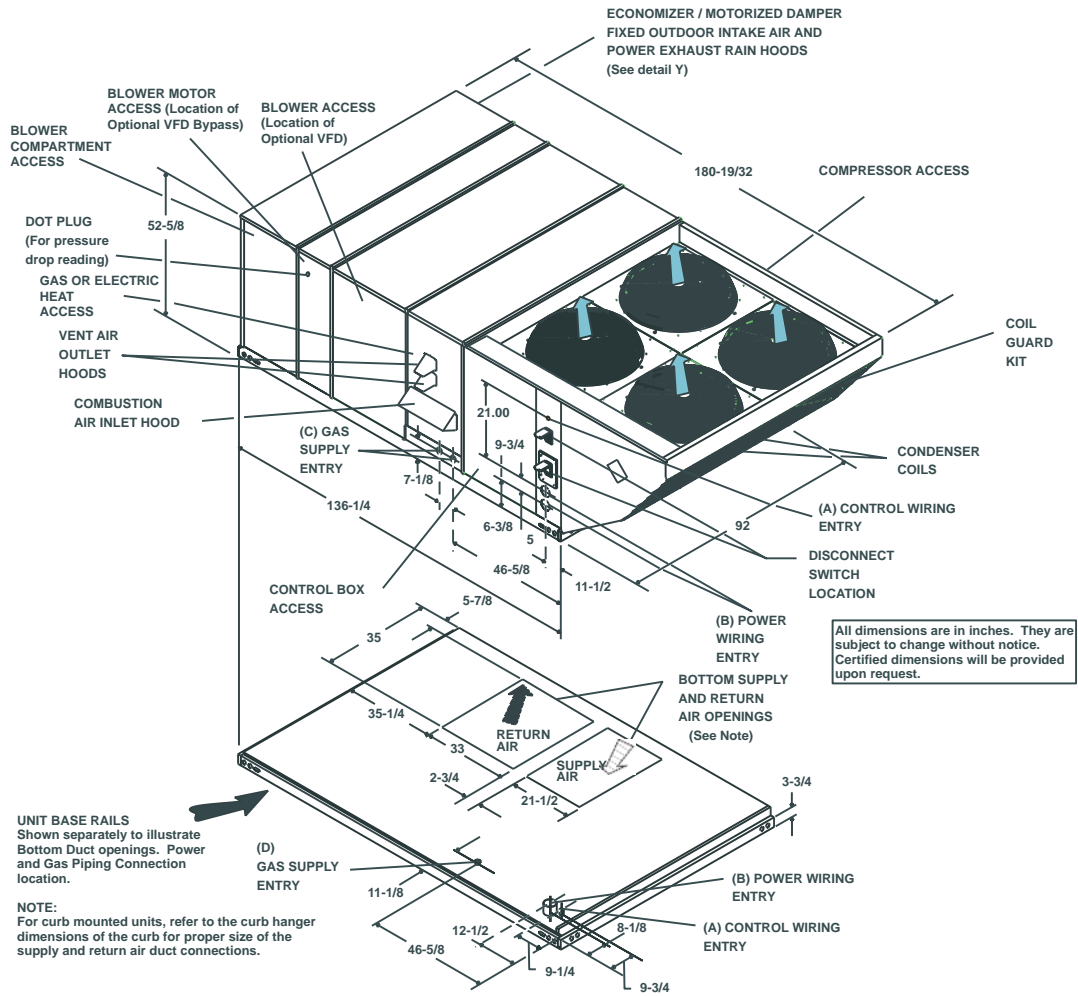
UNIT DIMENSIONS WR180, 240 & 300 (FRONT VIEW)
